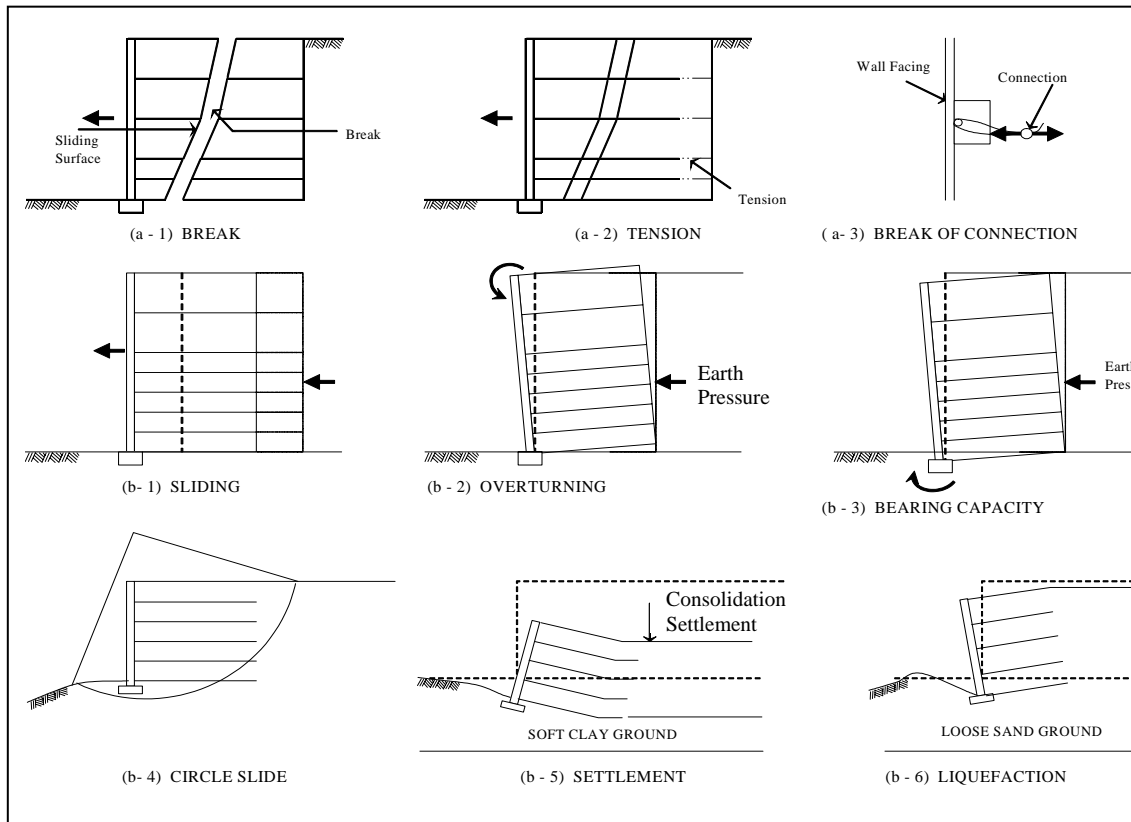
Collapse Modes and Issues to be considered in Design
